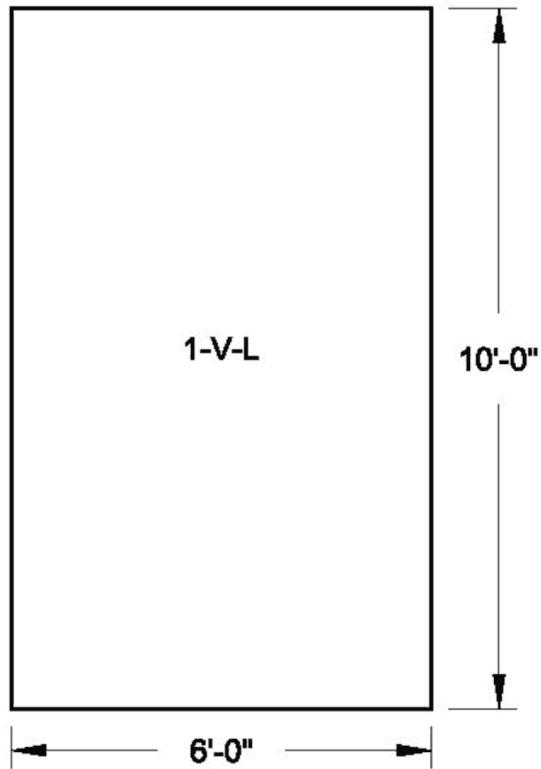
H.6-159 DGFOSV Roof 6 Looking Down
